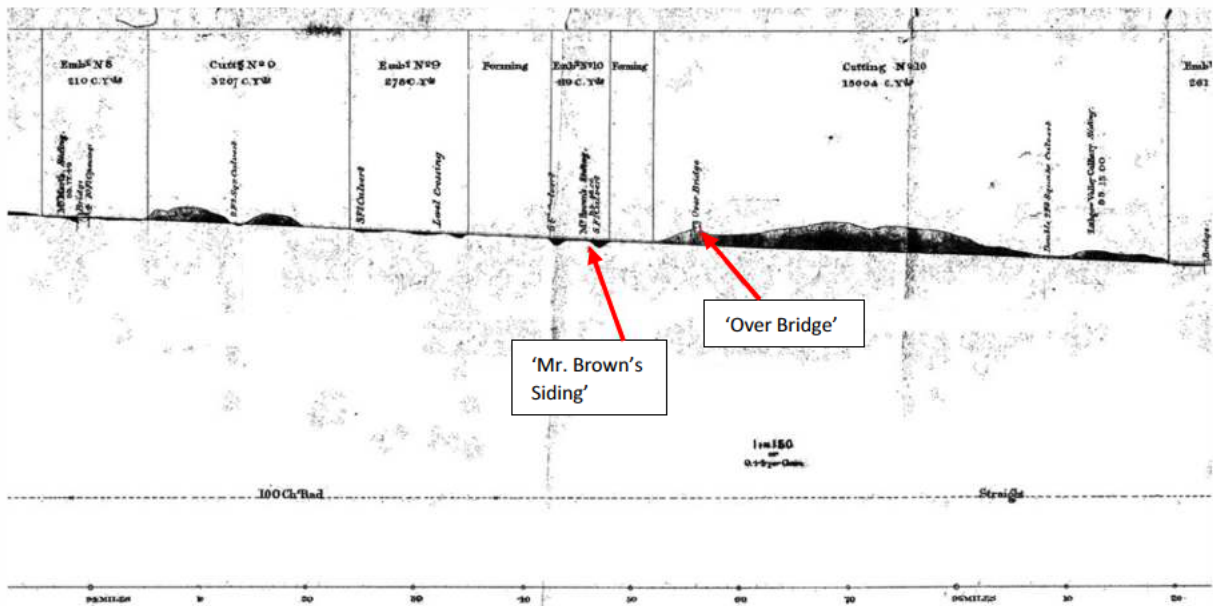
Detail from 1879 Main Western Line survey showing cuttings and embankments, Thomas Brown's siding, and the Bells Road (Bridge Street) Overbridge at Eskbank over Cutting No. 10. (Source: State Rail Archives CV-129078)
